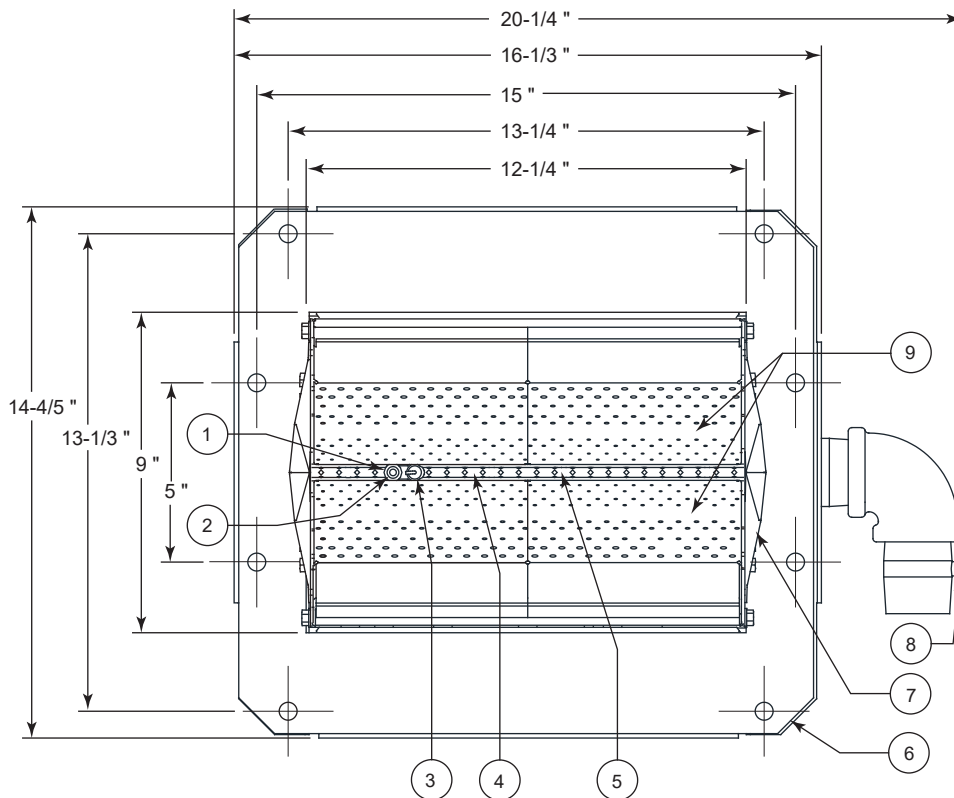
Internal View of Typical V2 Burner Housing Front - Internal Pilot - 120V Burners
